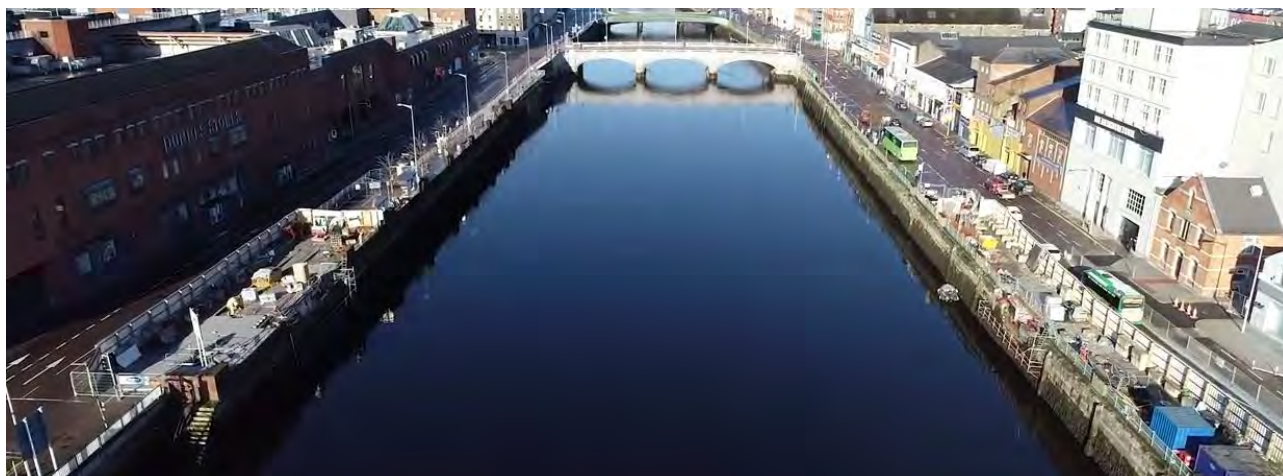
River Lee and St. Patrick's bridge in the background. The location for the new footbridge is at the bottom of the picture.
